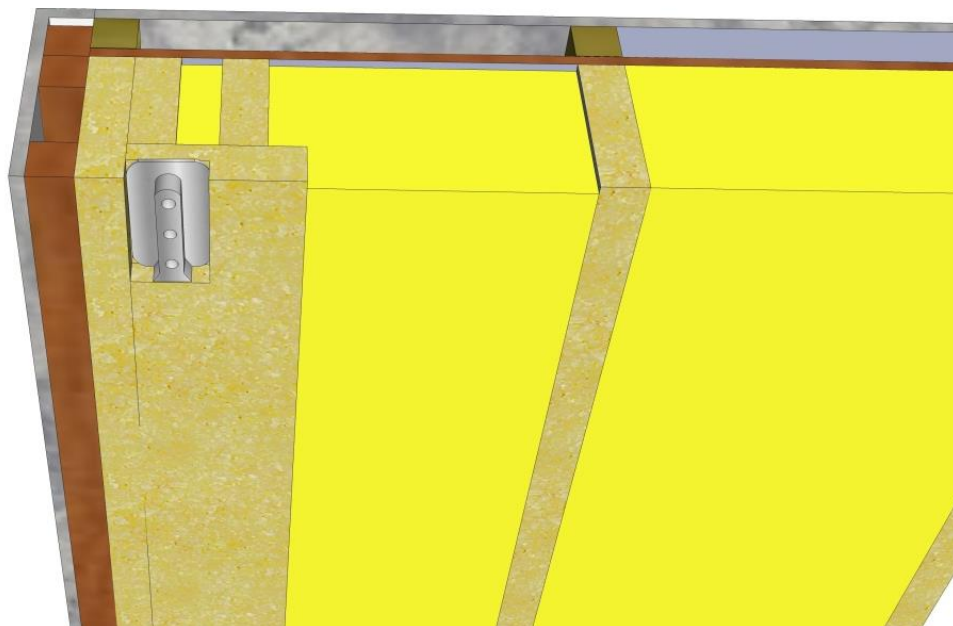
Detail showing the counter sunk position of the SHERPA connector
